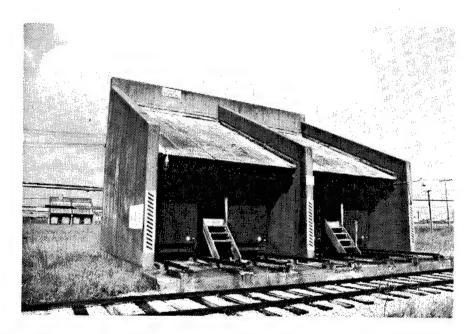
Building 214-88: Solvent Recovery House constructed of concrete.
